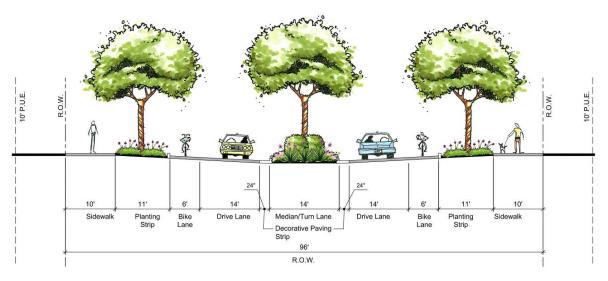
Street 'C1' - Connector Road - Section
